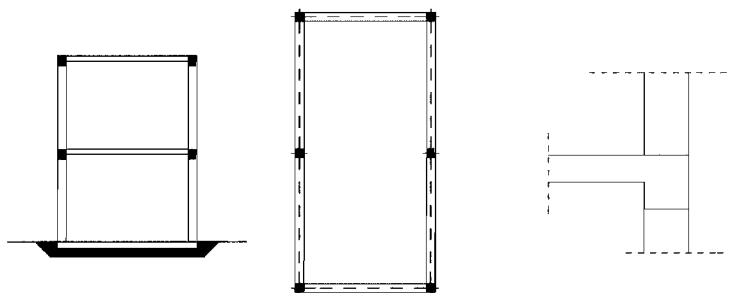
Reinforced concrete construction, 2 floors - RC2, section, floor plan and detail.
